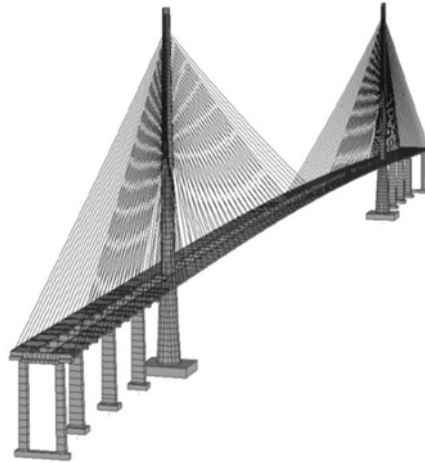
Example of Numerical Model of Undamaged Cable-Stayed Bridge [153]
